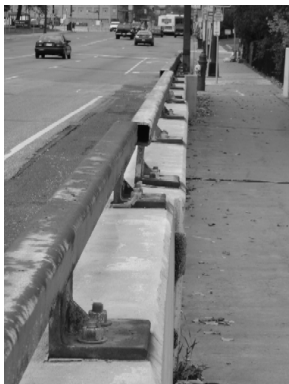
Looking north at the east vehicular railing on the north approach. Settlement has led to shifting of the barrier both vertically and laterally.
